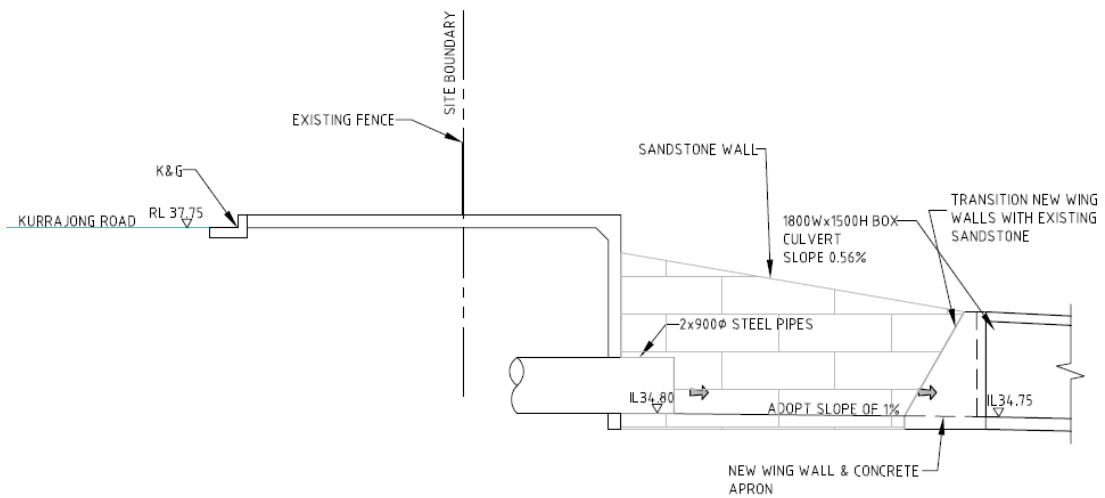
| Section of Box Culvert Connection with Kurrajong Road
